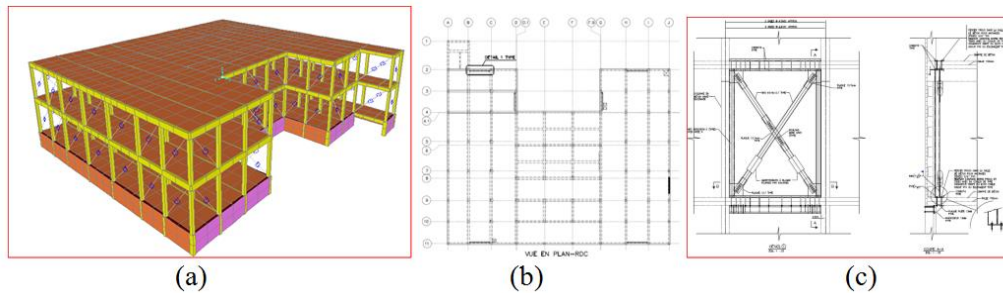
Numerical model including the “Link” elements in "3D numerical model". (a); location of the bracings with dampers on the ground floor of the building (b); and unit of bracing with dampers (c)
